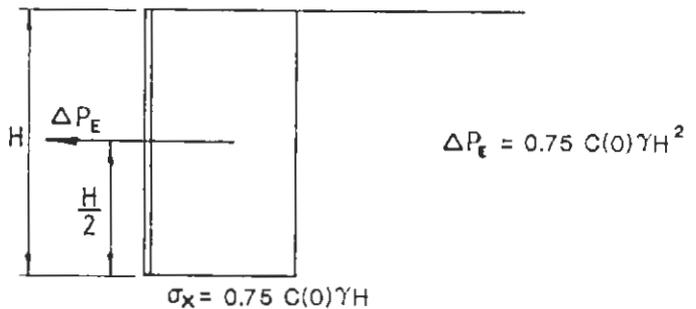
EQ PRESSURE INCREMENT ON STIFF WALL
